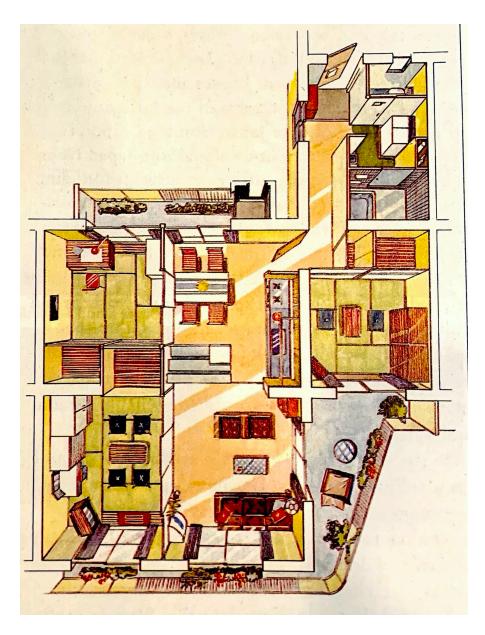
Japan Housing Corporation 3LDK floor plan for 1973. 715
